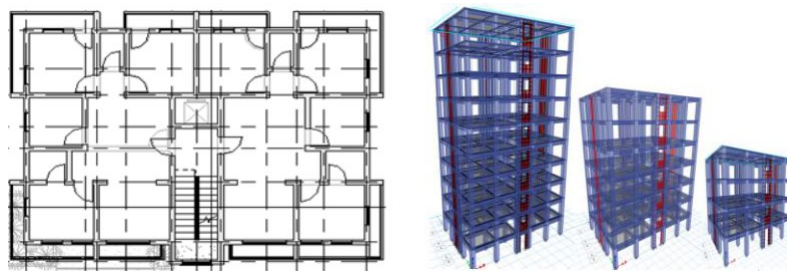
The typical floor plan and the 3D views of the buildings considered in this study
